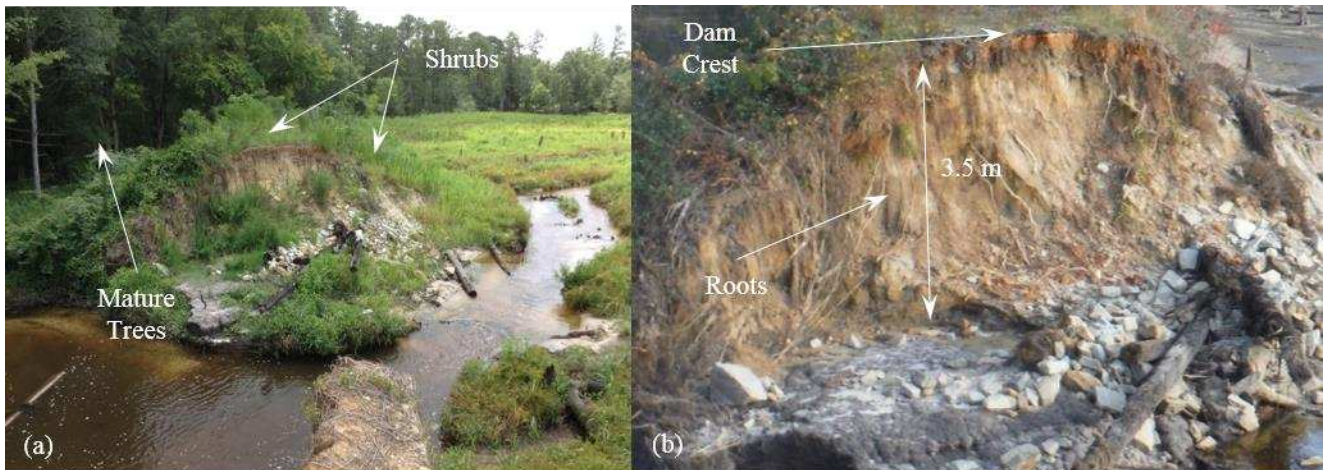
Vegetation on Dam C: southeast views from crest of a) crest of dam with tall grasses and small shrubs (taken 10 months after breach), and b) exposed deep root structures at southeast breach wall (taken 1 month after breach).
